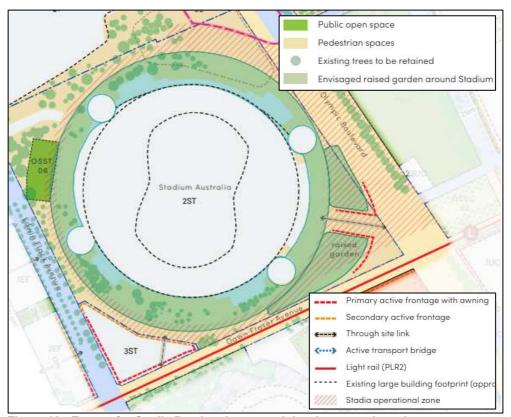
Extract for Stadia Precinct layout and development sites plan (source: Master Plan 2050)
